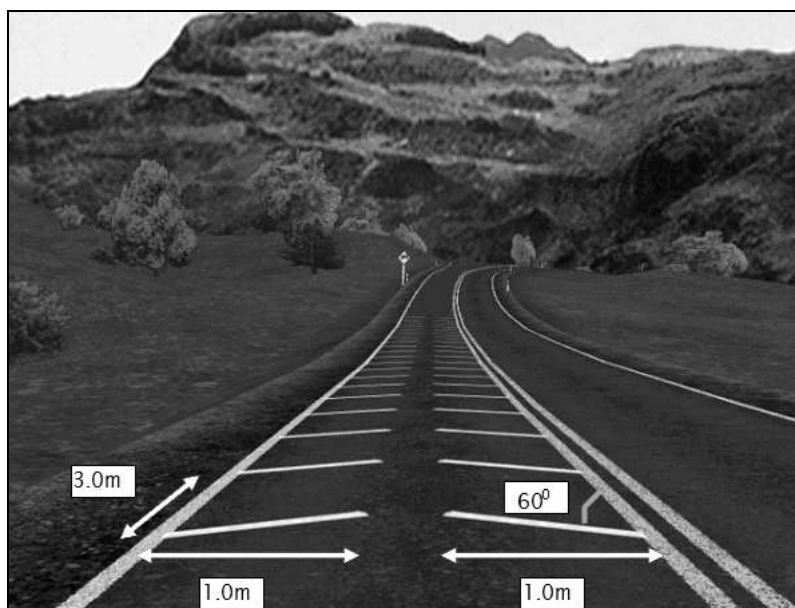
The straight section prior to the bridge approach (image from SH53 network video)
